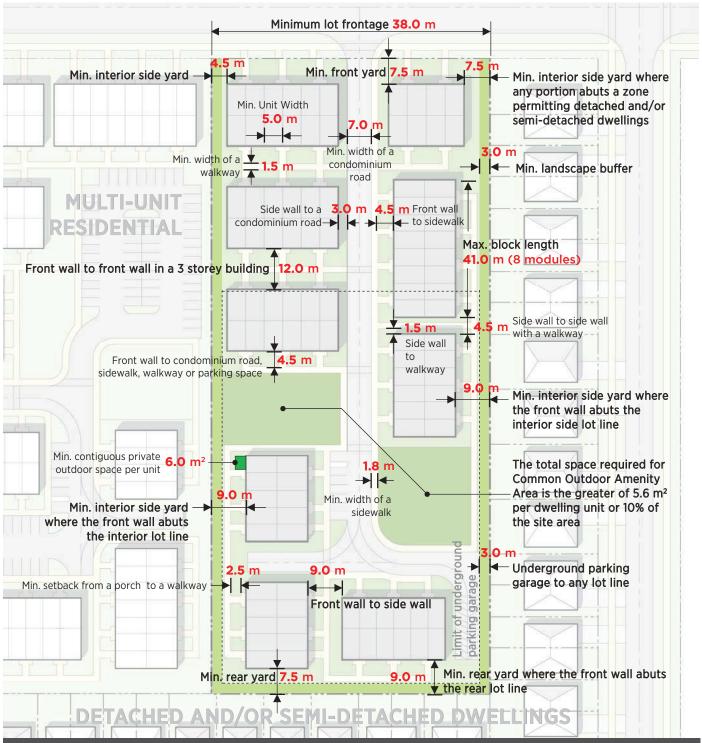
Standard Dimensions for Back to Back Townhouses (RM10). For Additional Standards refer to the Zoning By-Law.
